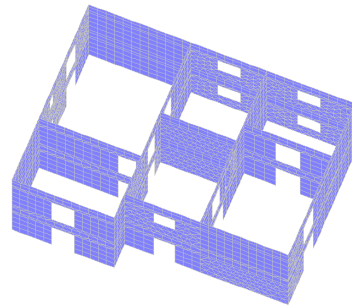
The finite element model of structural walls of the two-storey “SMB”.
